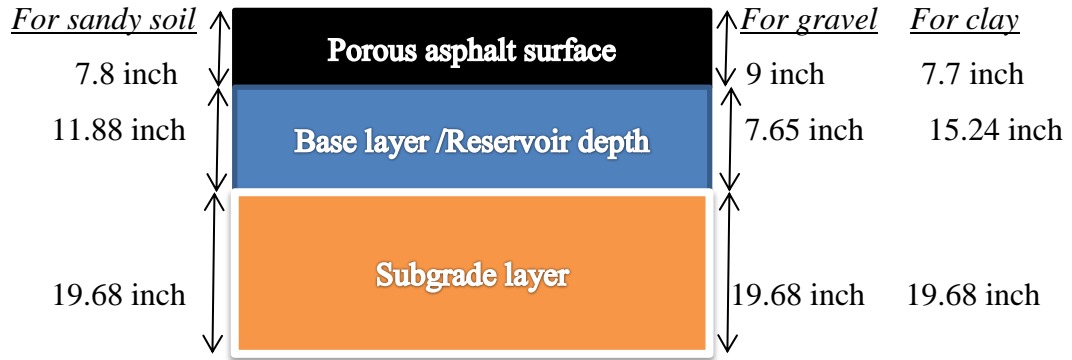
Typical Section of Porous Asphalt Pavement Evaluated by Hydraulic Design
